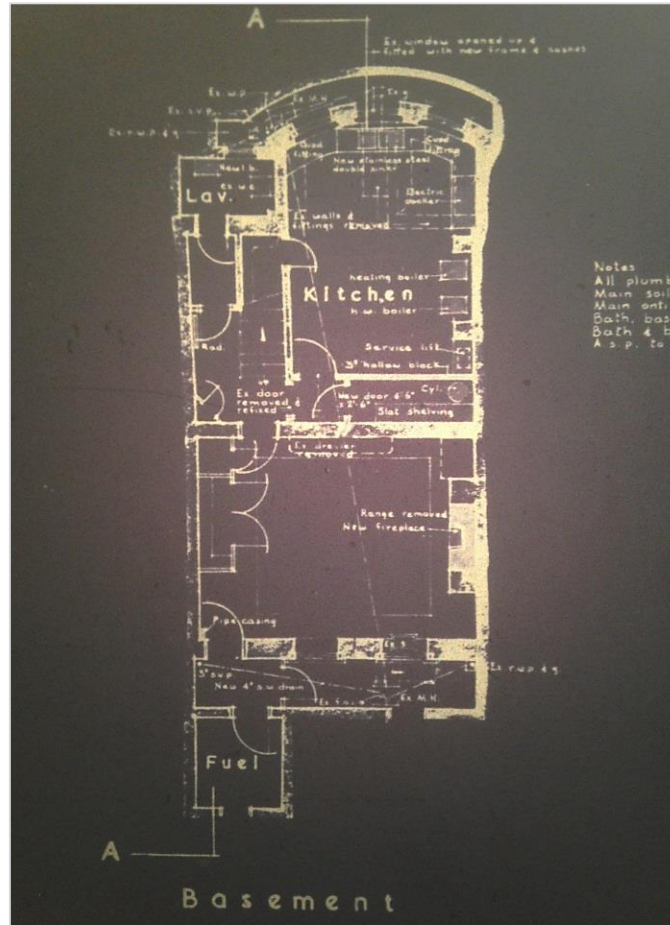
1950 drainage plan: lower ground floor¹⁶
